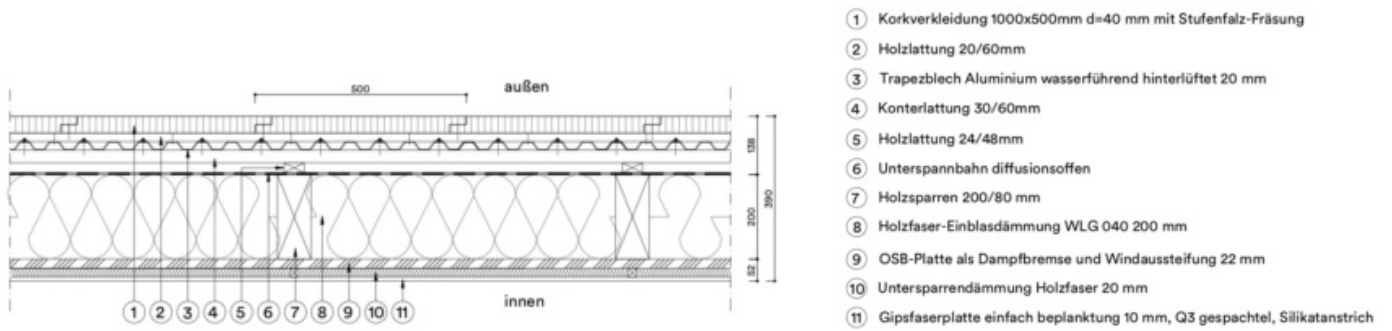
Cork Screw House - cork wall configuration (Marani, 2019)
